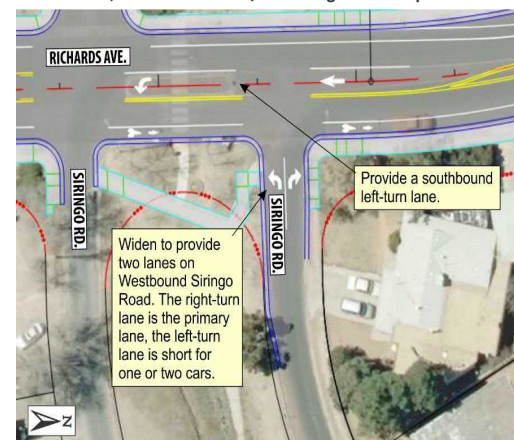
, Cerrillos Road/Richards Avenue Improvements
